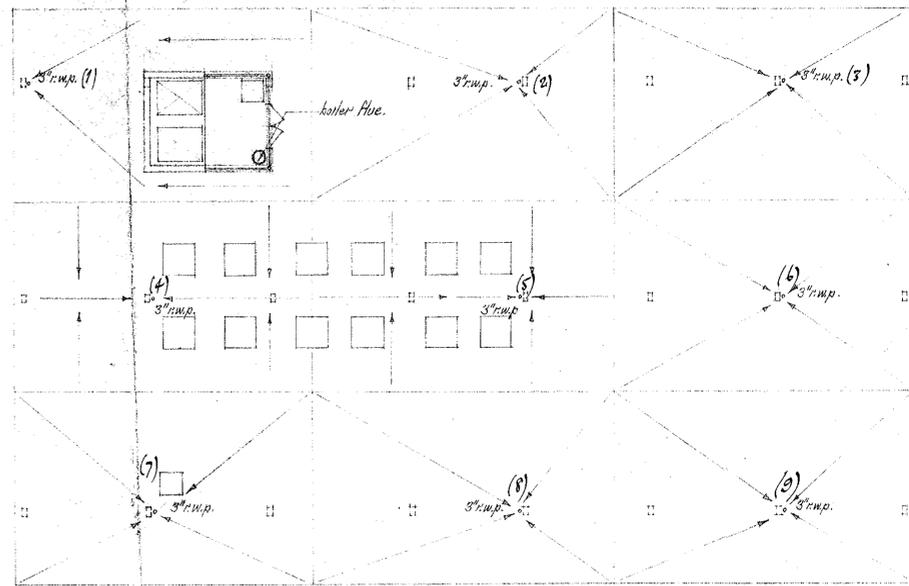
DETAILS OF C.I. DRAINS TO BE LAID DURING RECONSTRUCTION OF PITS 6 & 7
